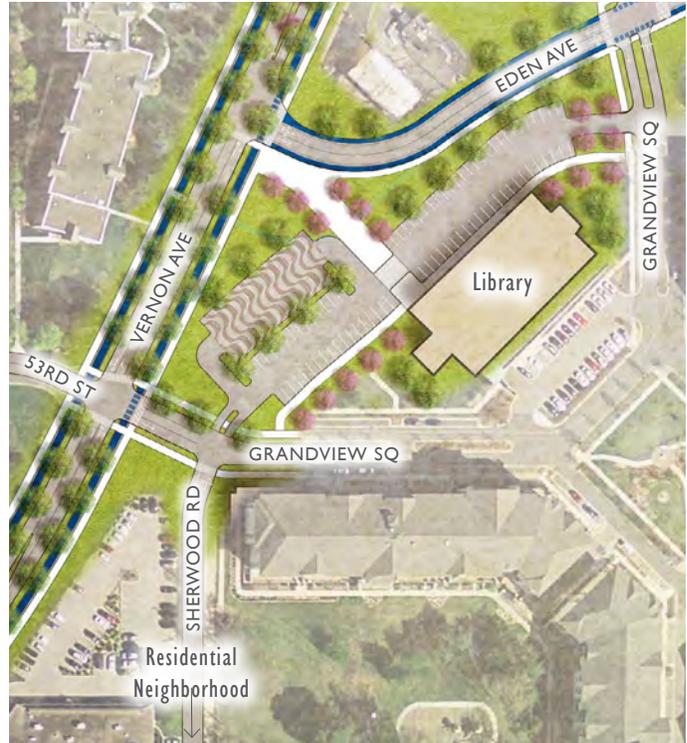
Plan of 53rd Street, Vernon Avenue and Eden Avenue, showing access to the residential neighborhood to the south; 1" = 200'.
